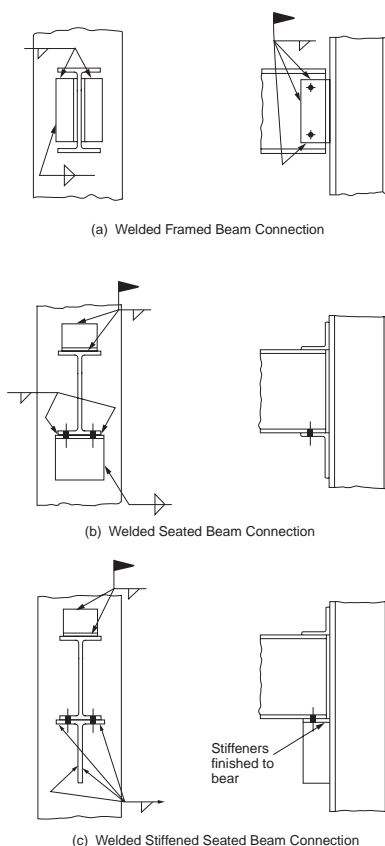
Welded shear connections: (a) framed beam connection, (b) seated beam connection, (c) stiffened seated beam connection.
